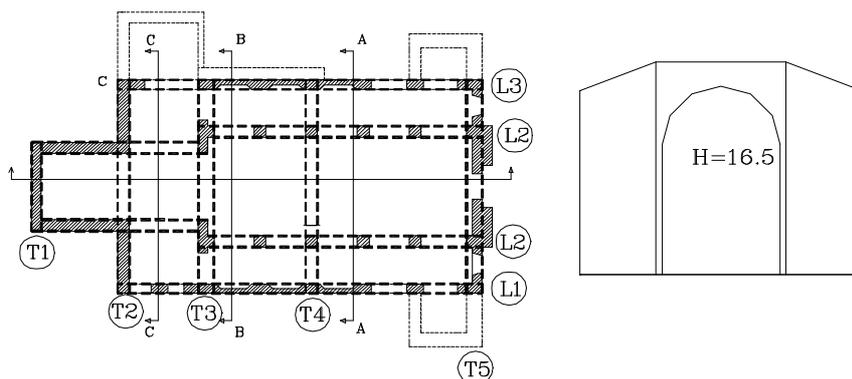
Plan and section at the triumphal arch of the san Ippolisto Martire church
